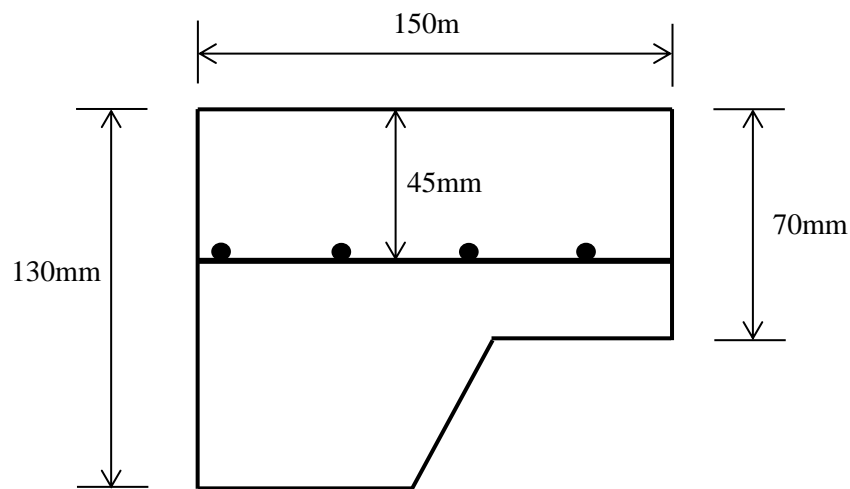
Concrete slab physical cross-section with trapezoidal decking profile
